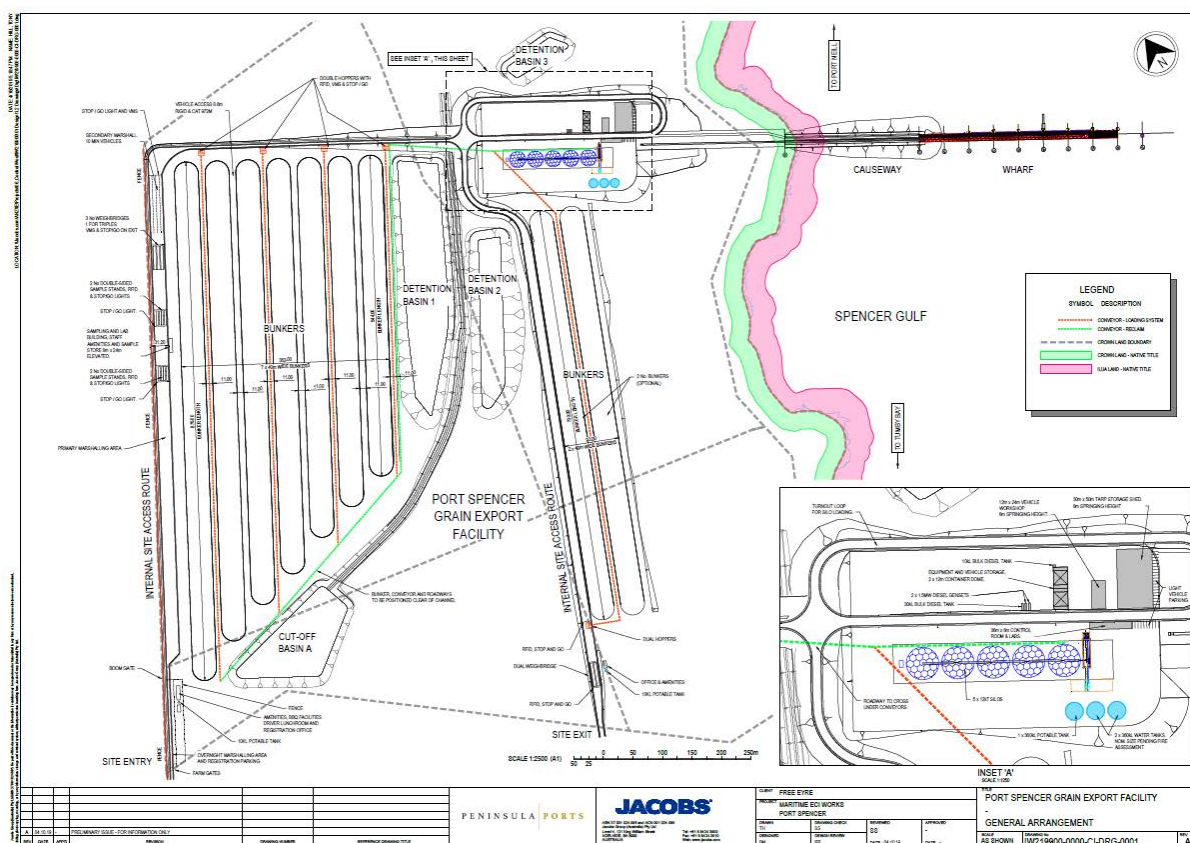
Modified layout plan as lodged (Source: APER; Section 9)
